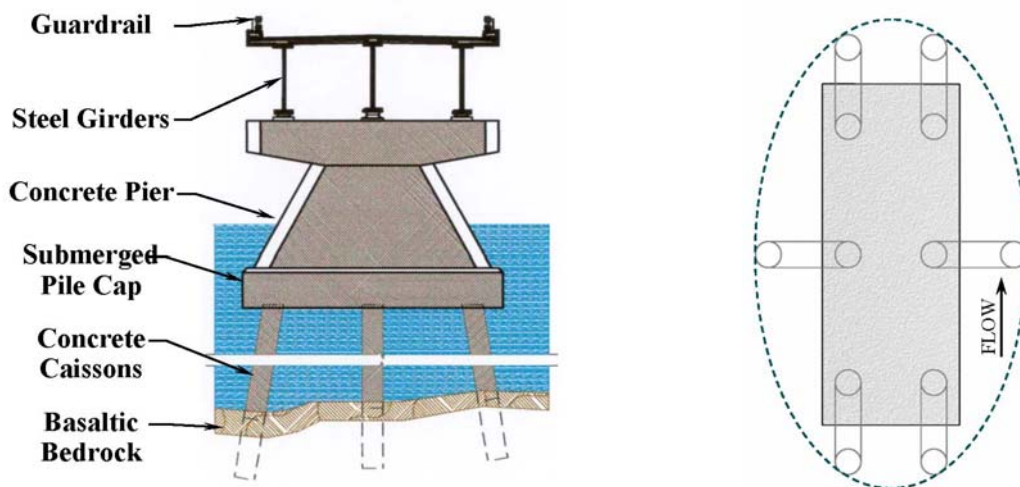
Pier geometry, underwater pile cap and caisson layout for a typical river pier.
